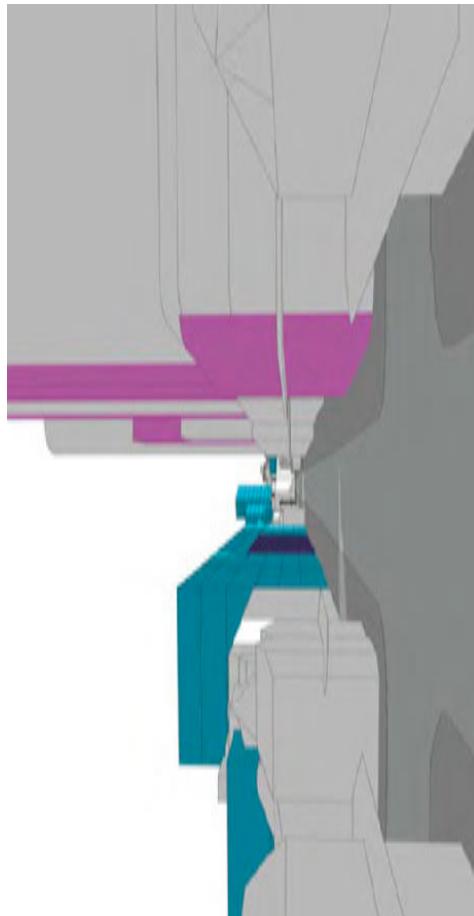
View 1 - northward, Corner Buckland Street and Botany Road looking toward Waterloo Metro Quarter
